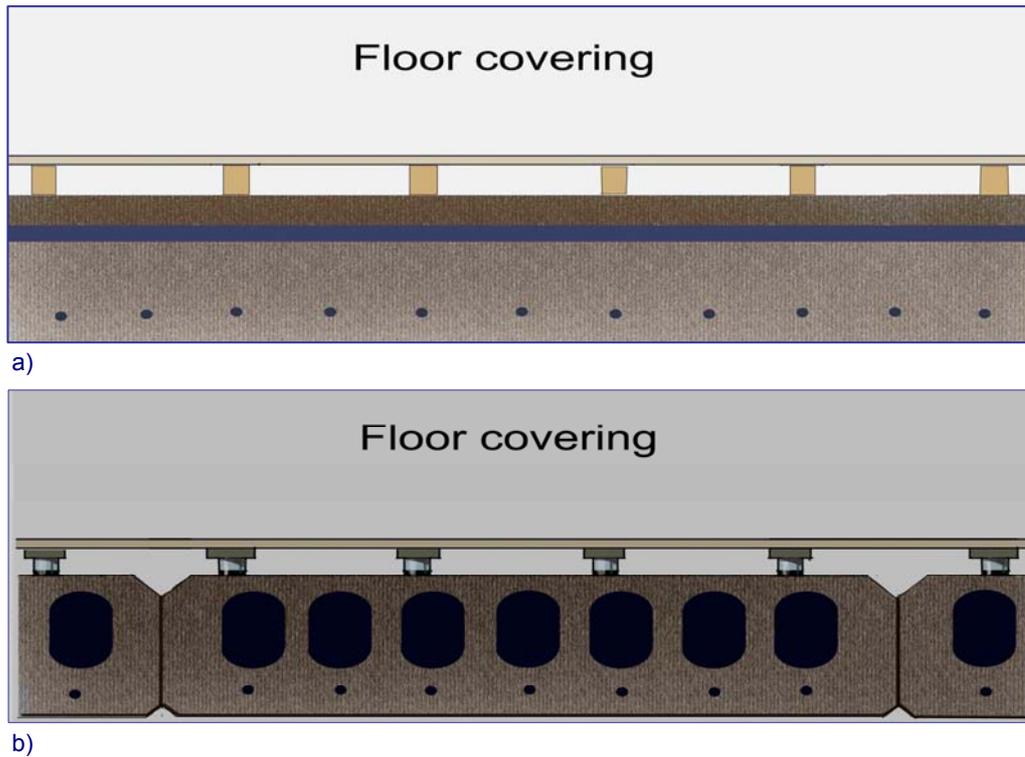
Basic types of currently used water based thermo active building components: a) on-site constructed floor (with insulation); b) hollow deck with integrated pipes
